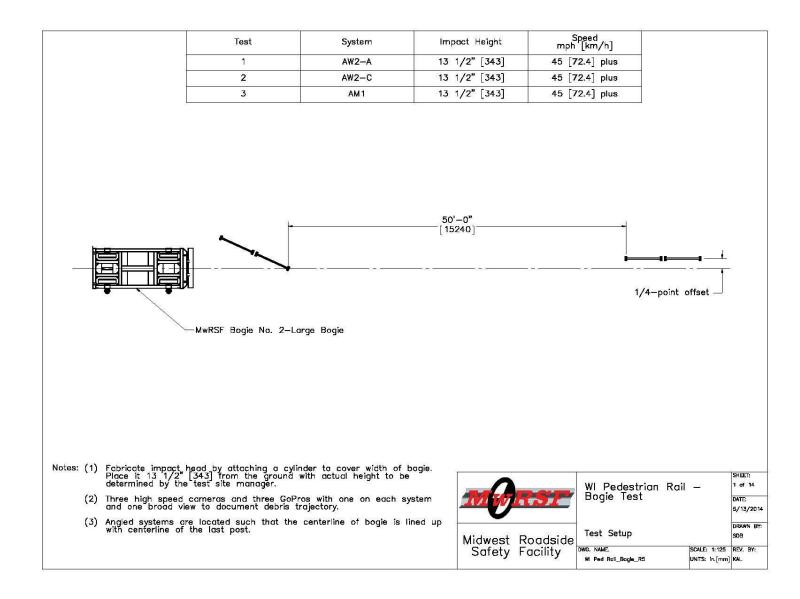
Pedestrian Rail Test Setup, Designs AW2-A, AW2-C and AM-1
